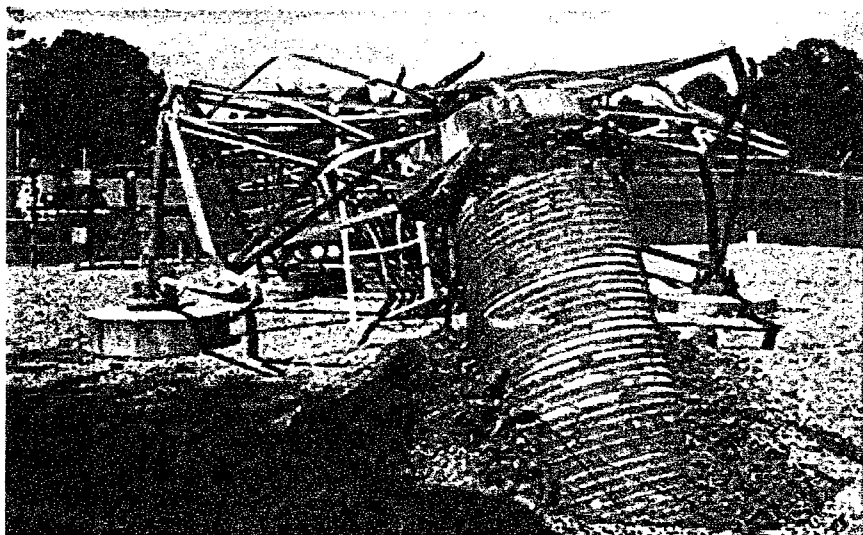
2 Foundation failures due to pullout forces (Reference 17)
